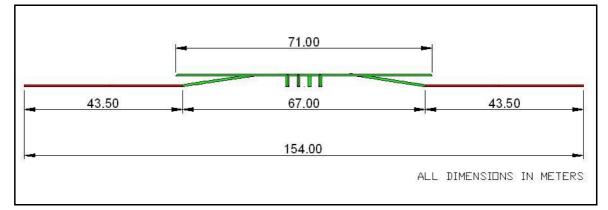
Side View Level 2 Dimensions #2
